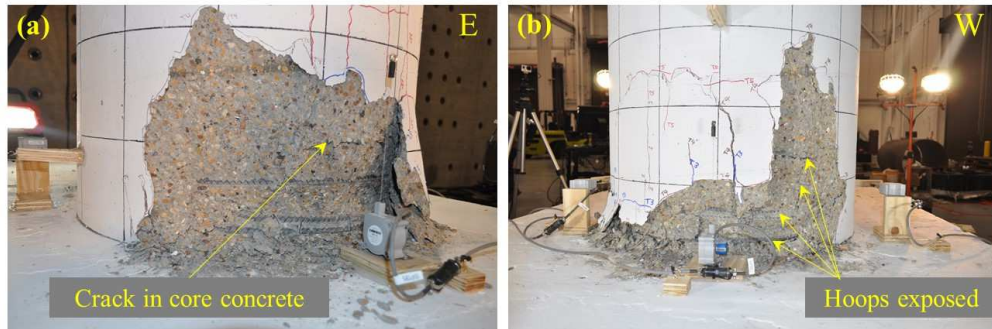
Damage in RC rocking column at 5.54% drift ratio: (a) crack in the core concrete on east side; (b) hoops exposed on the west side.
